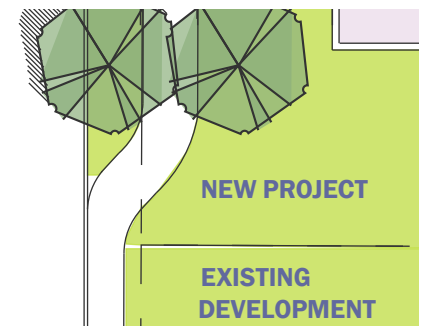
Transition from existing narrow sidewalk to new parkway/walkway.
